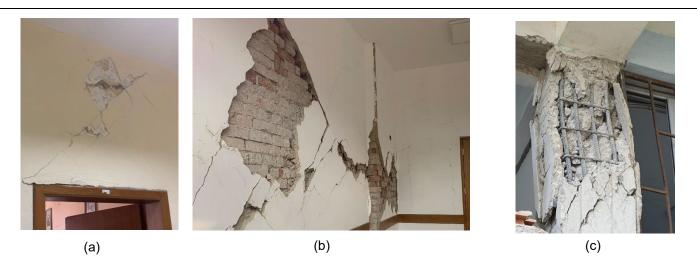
Damage patterns in school facilities, including (a) cracking above classroom doors in a masonry school building in Shijak, (b) structural damage of masonry walls in a school building in Thumanë, and (c) a damaged reinforced concrete column in a reinforced concrete school building in Durrës (photos: M. Baballëku).
